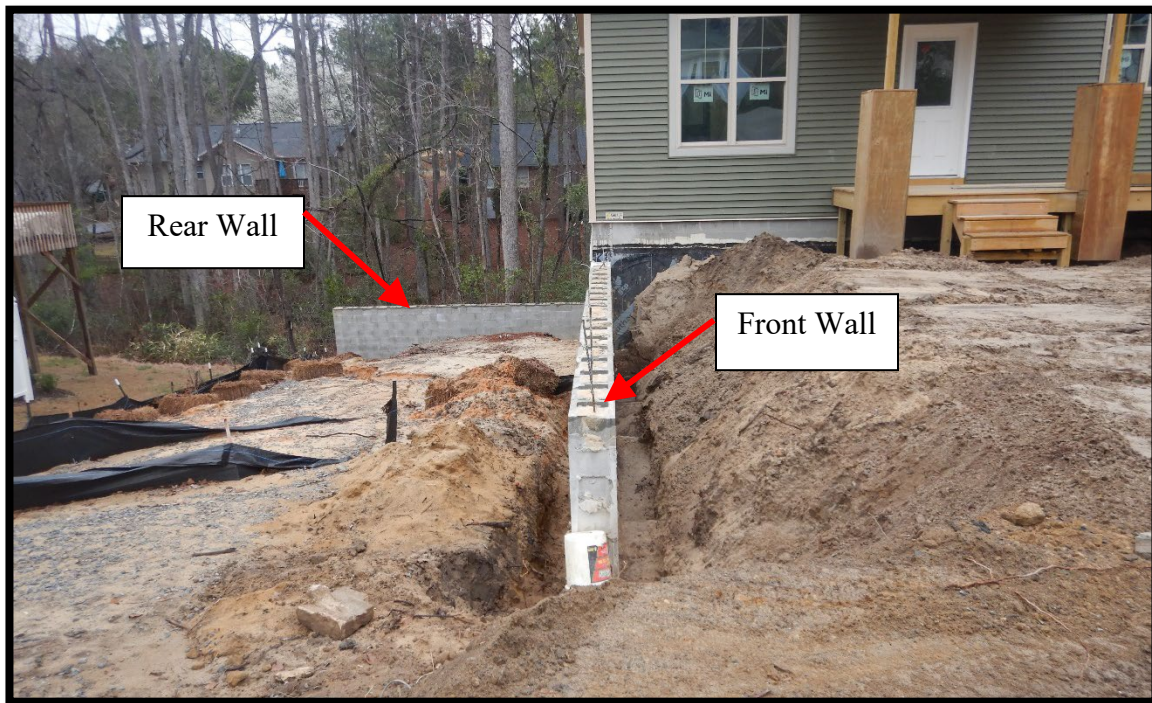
The footing under the front wall was 3 feet wide. The wall had approximately 7'-4" of unbalanced fill. The rear wall had about 5 feet of unbalanced fill.
